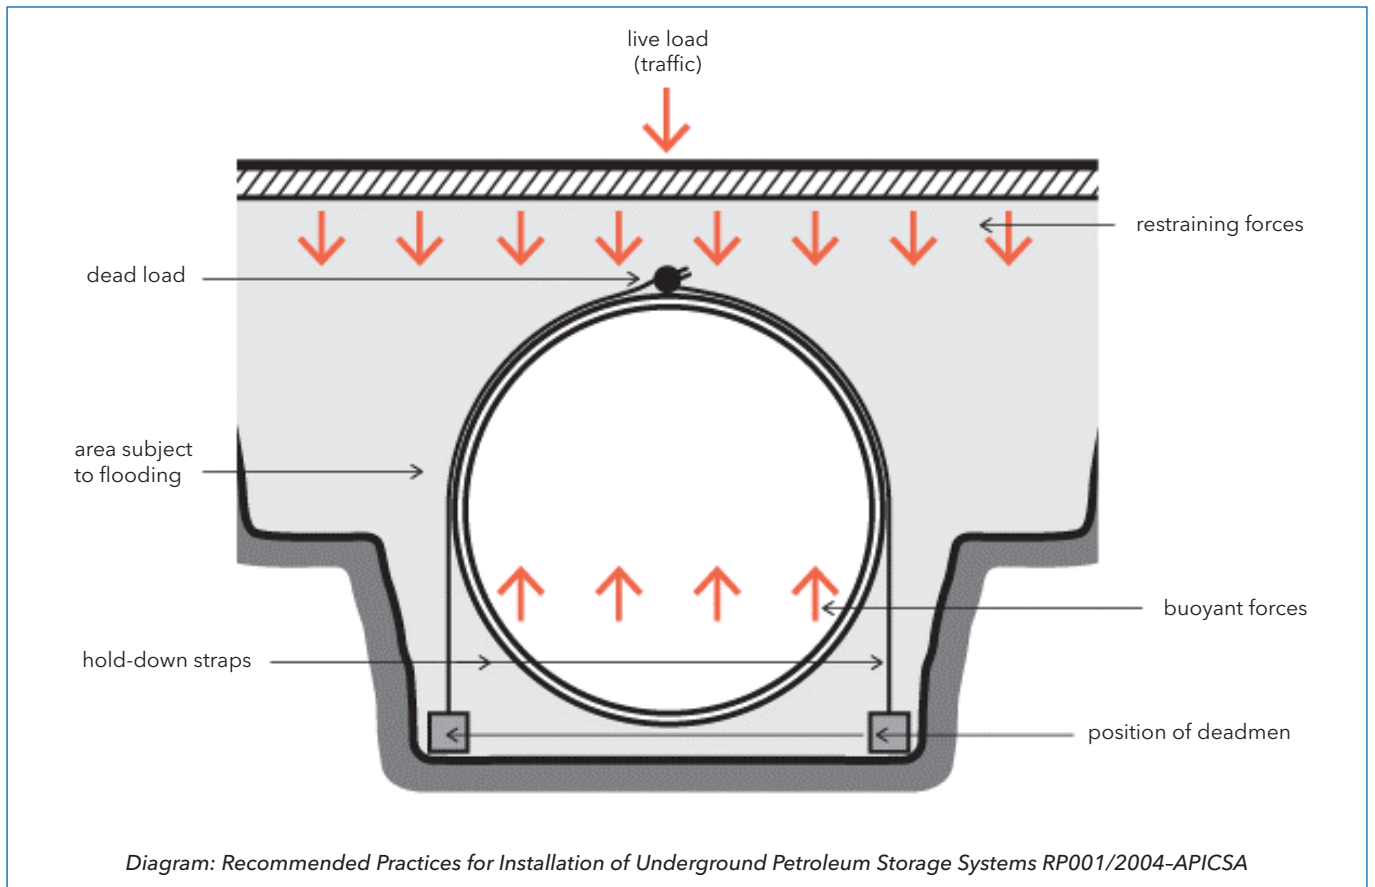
Options for anchoring of underground tanks with poured-in-place concrete counterweights
